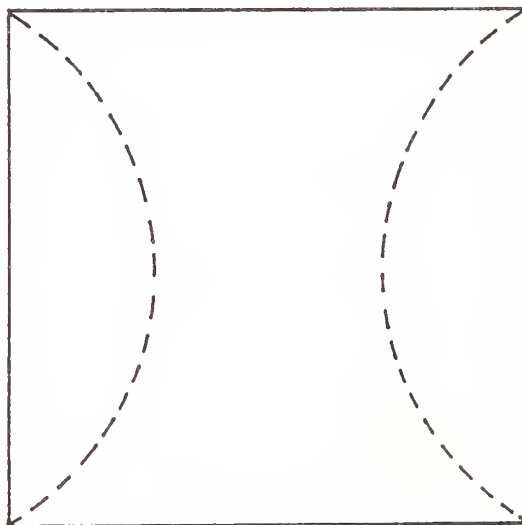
Ideal failure of a compressive concrete cube specimen.
